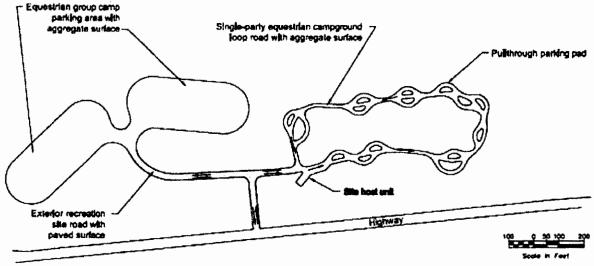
Pavement should not be used in equestrian areas. Paving the exterior recreation site road is an exception to this rule because stock seldom travel there.
